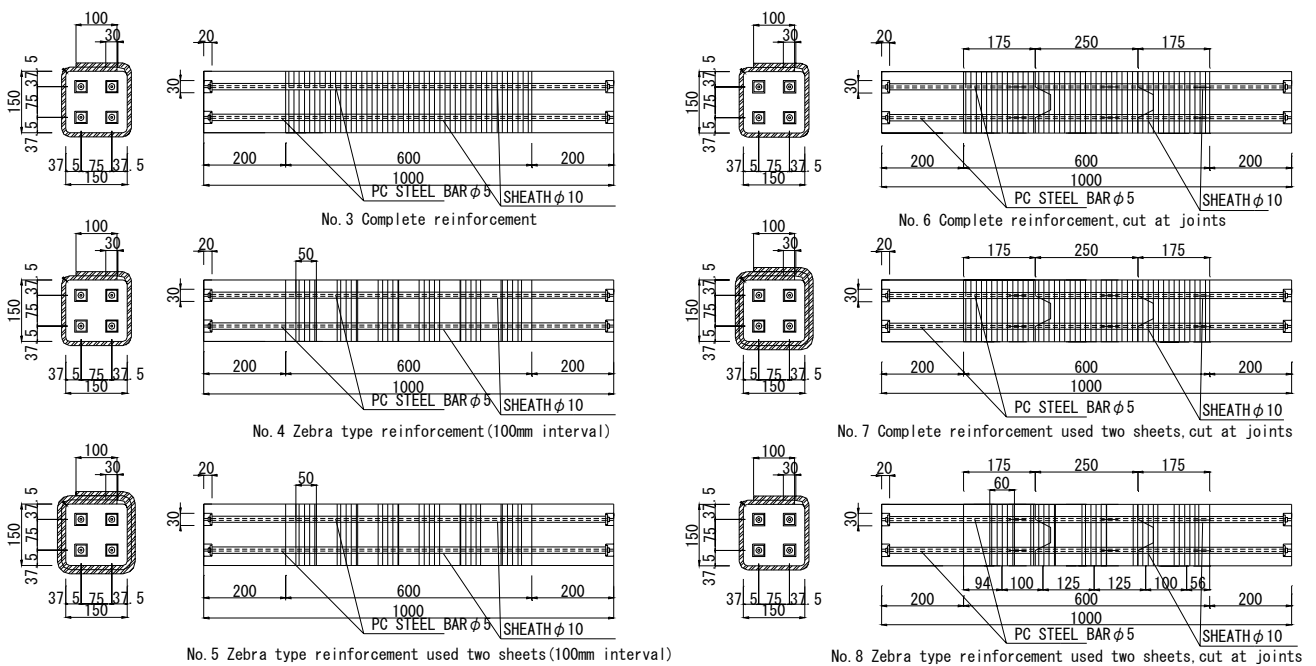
Dimensions and reinforcement arrangement Specimens of the Test series 2
